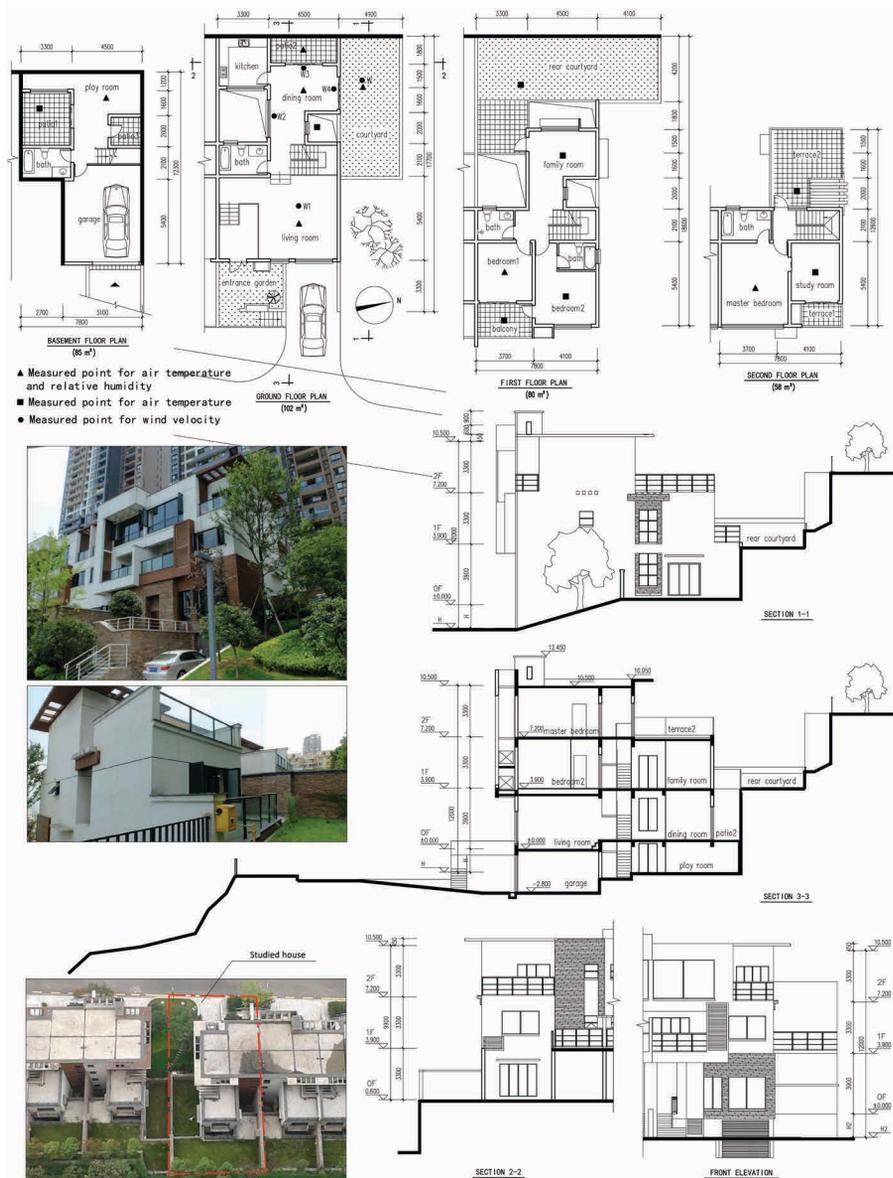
Plans, elevation, sections, appearance and measurement points of the studied house in Chongqing, China
